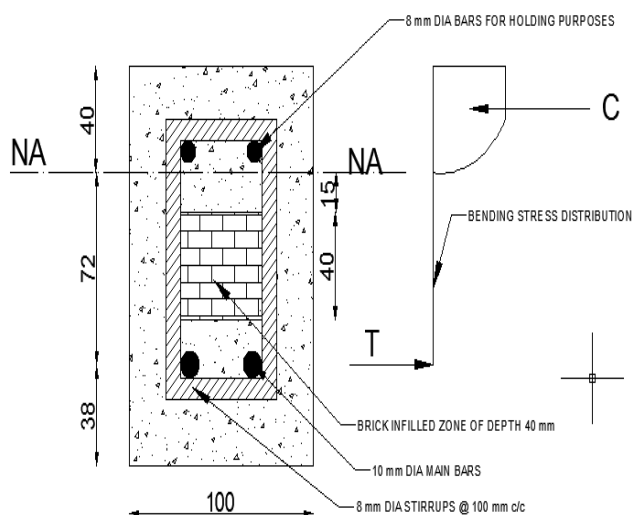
Detailing of ICB beams (All dimensions are in mm)
